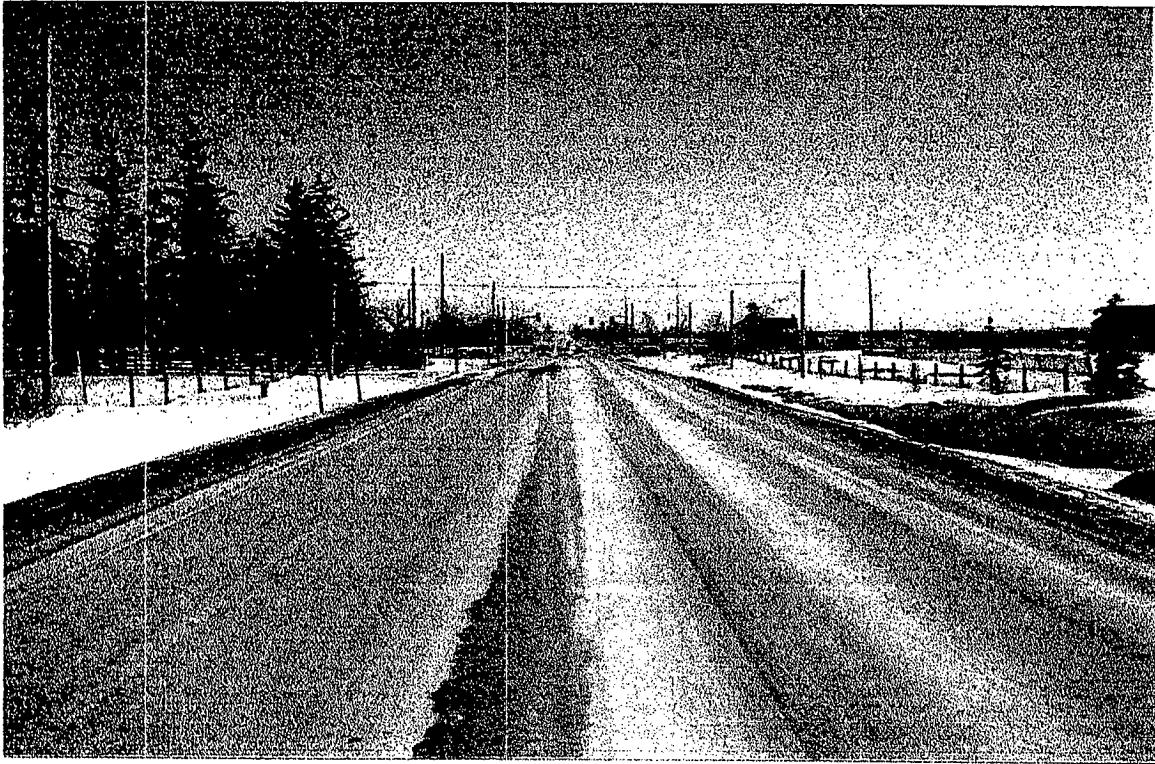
Looking south along Dixie Road toward the Mayfield Road intersection.
